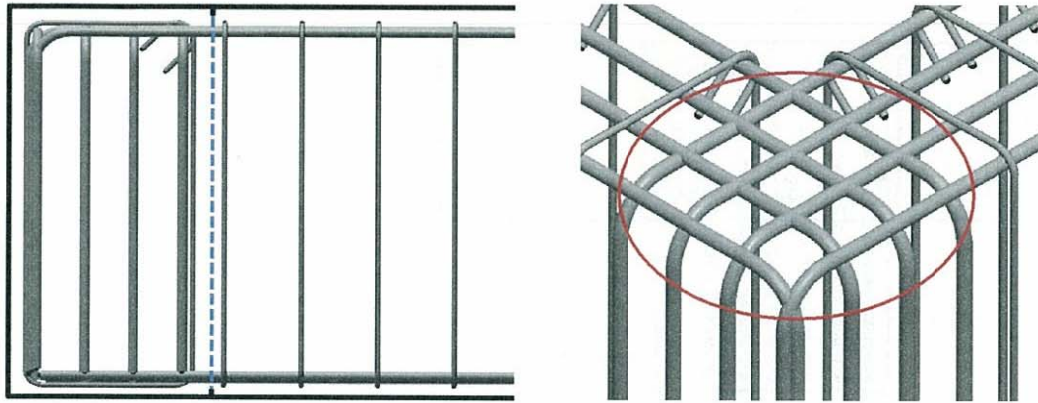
Clash of reinforcing bars in the connection of longitudinal and lateral RC beams
